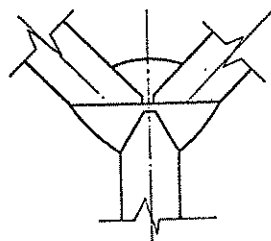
Alternative method of connecting reinforcing members without a central boss
